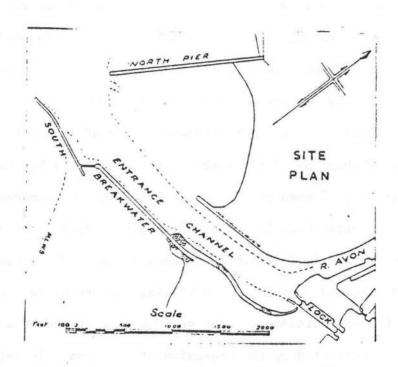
Site Plan Showing the Breakwater at Port Talbot
